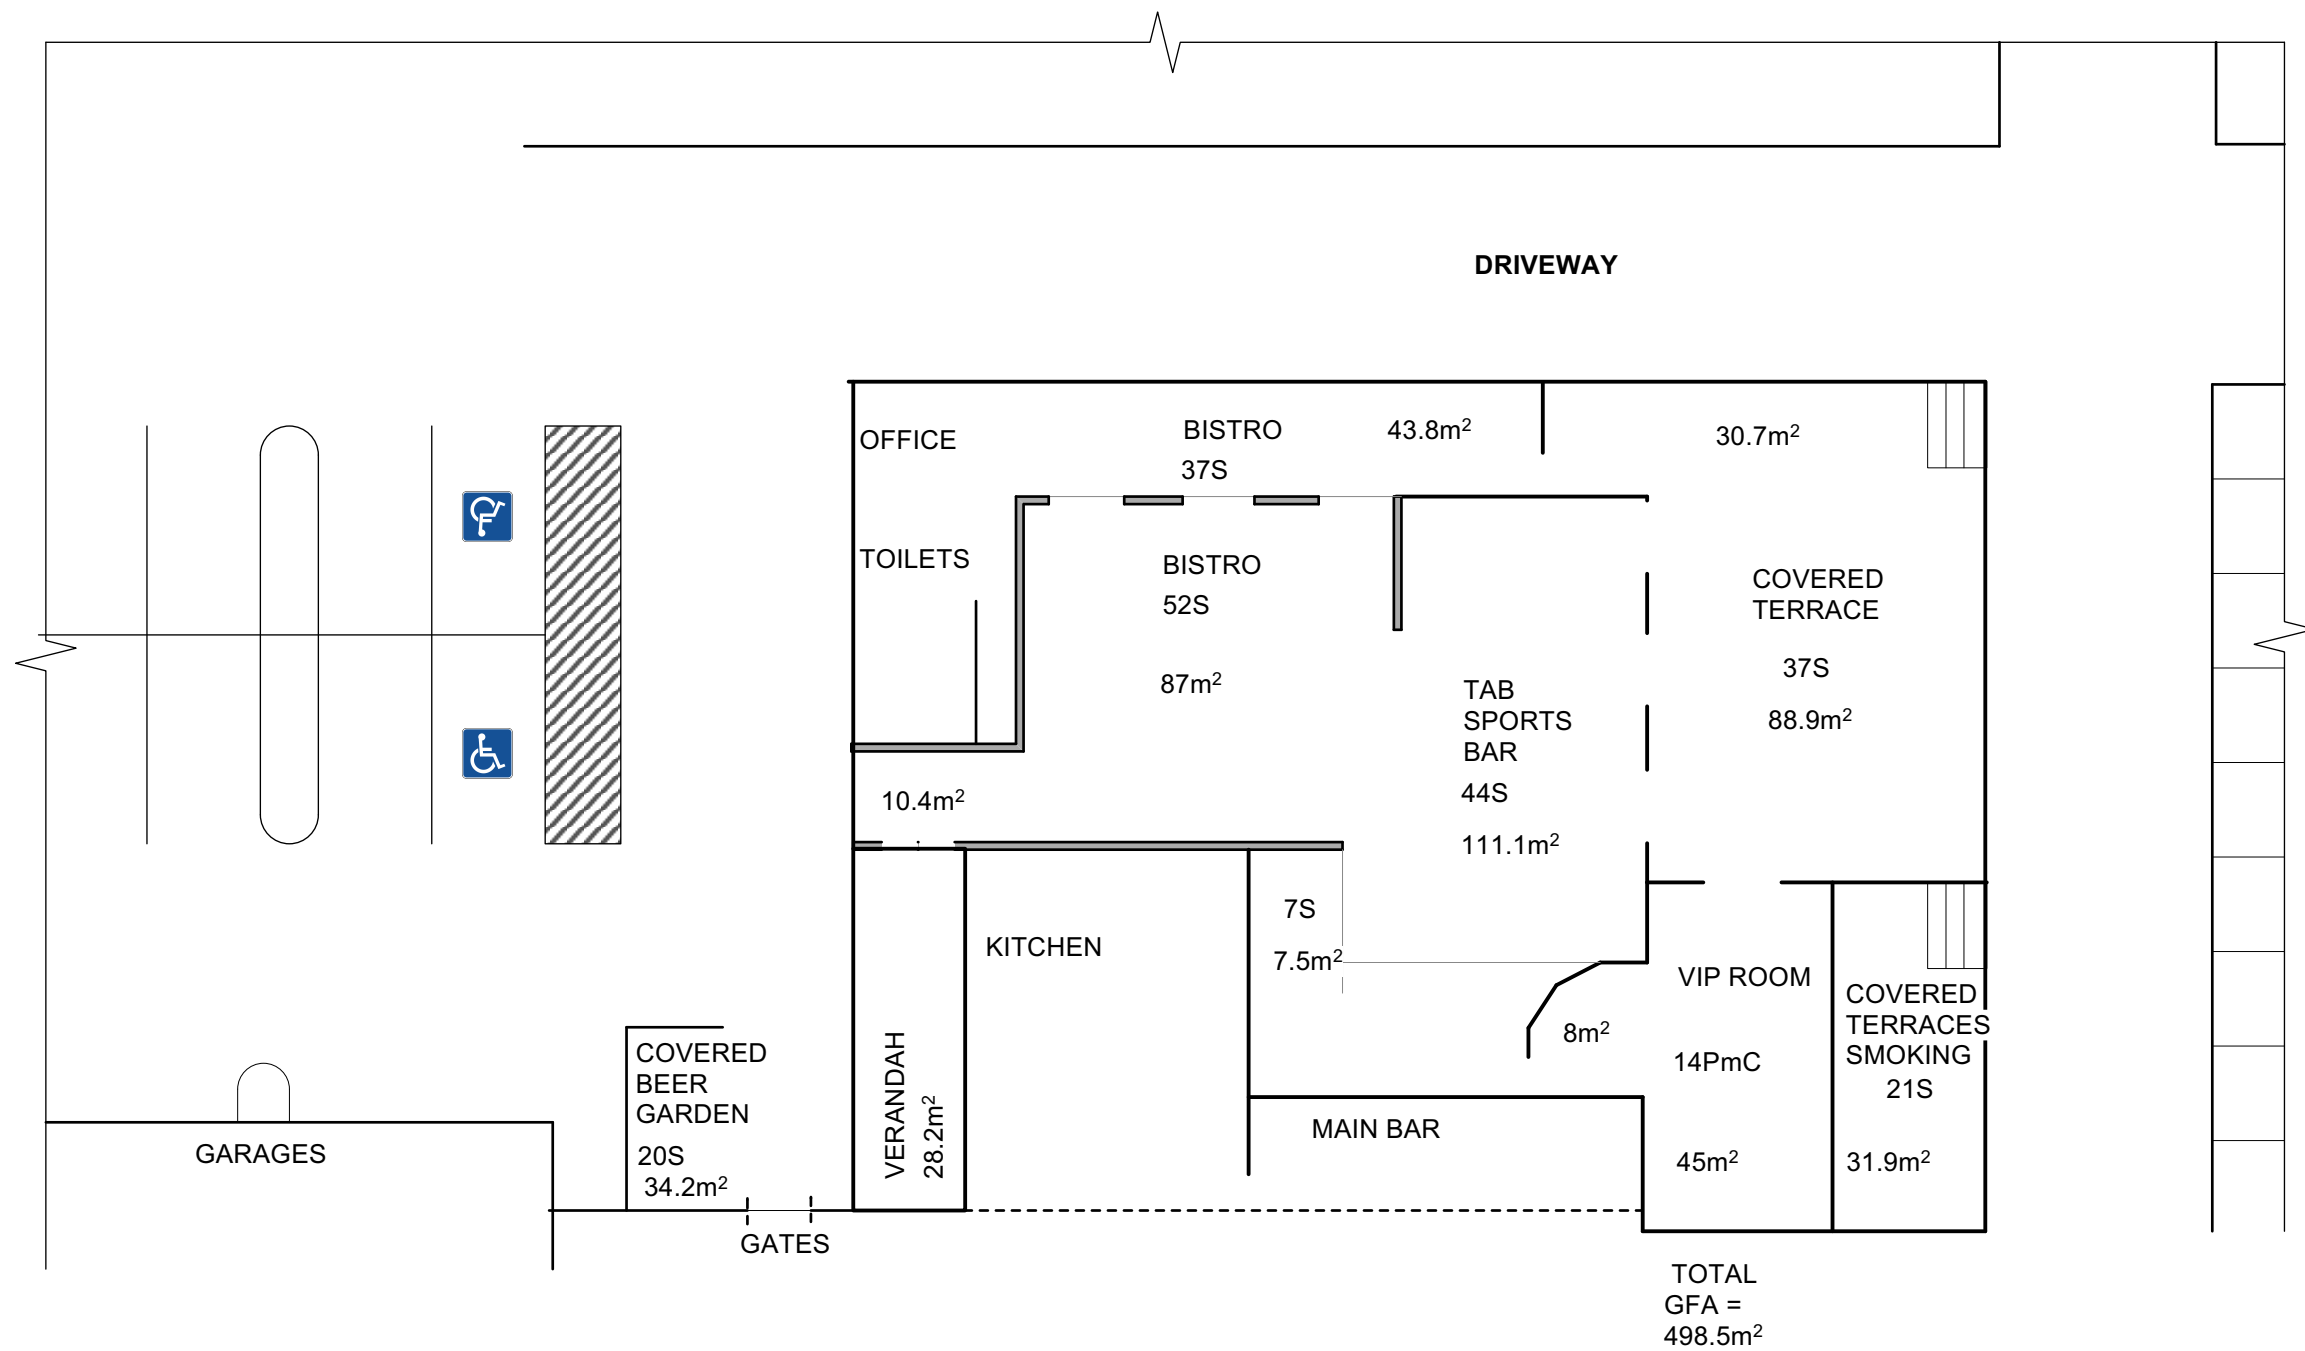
FLOOR PLAN & SEATING COOEE HOTEL
